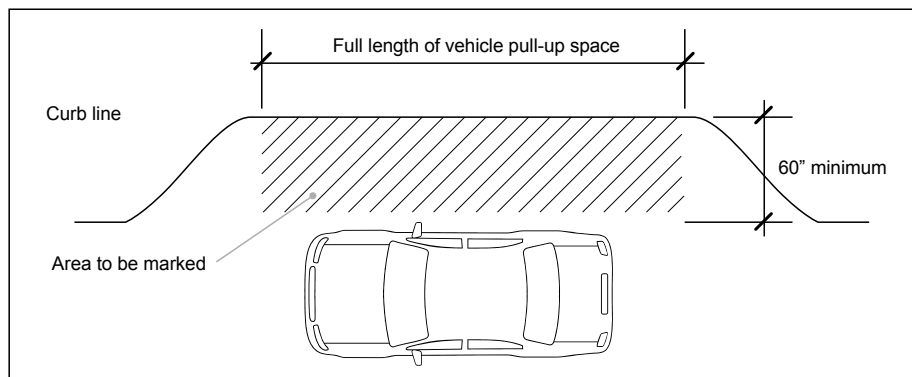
Required dimensions for passenger loading zones and access aisle
